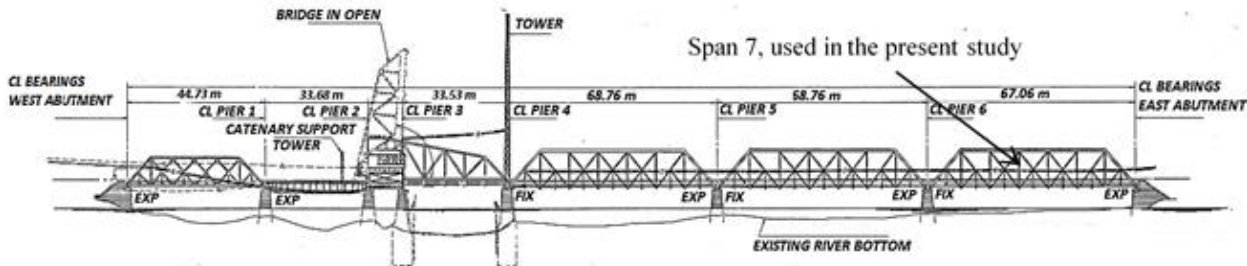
Elevation view of Devon Bridge, facing upstream (north).
